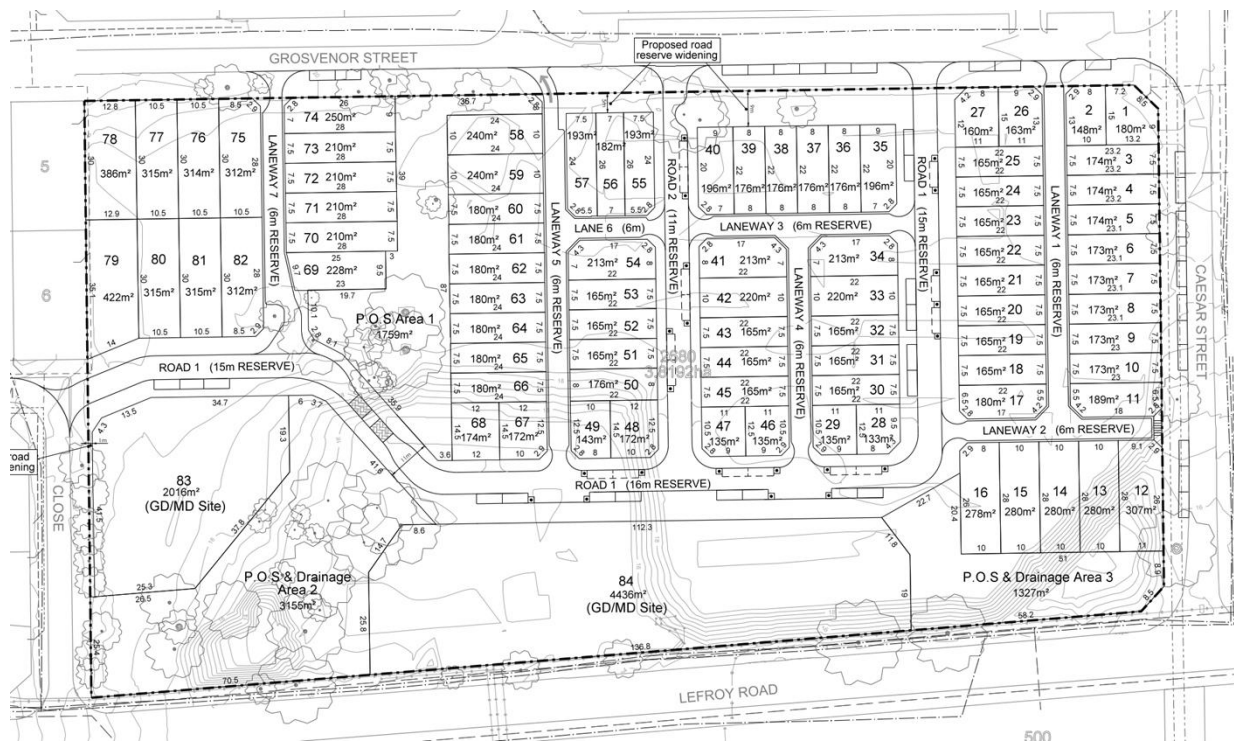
Proposed Plan of Subdivision Extract (refer also, attachment 1).
